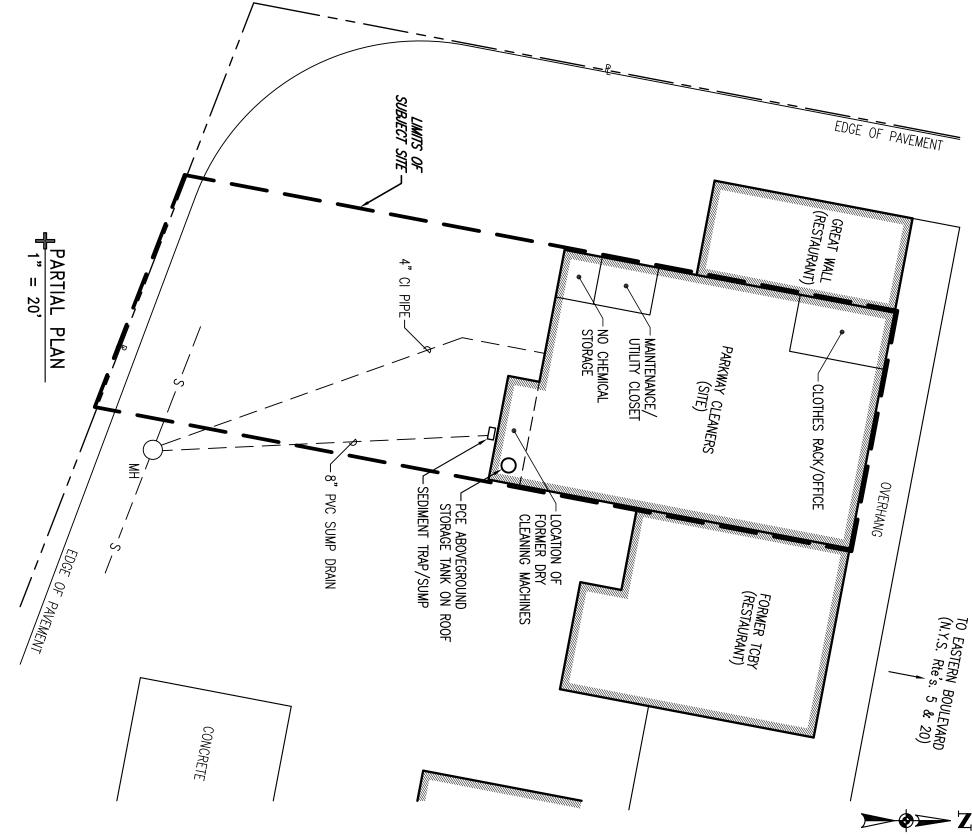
2105R-99 FORMER PARKWAY CLEANERS VCP SITE NO. V00238-8 CANANDAIGUA, NEW YORK
